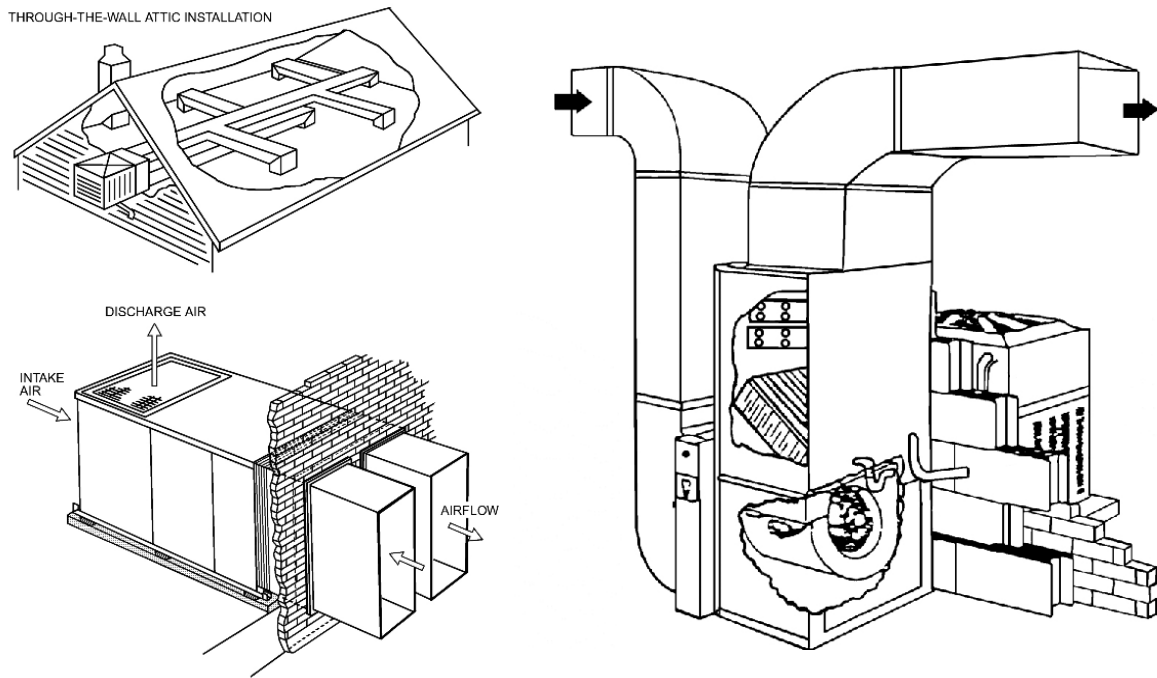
Installation floor plan of an air-to-air heat pump and outdoor and indoor unit (source: Baxter, 2009)
